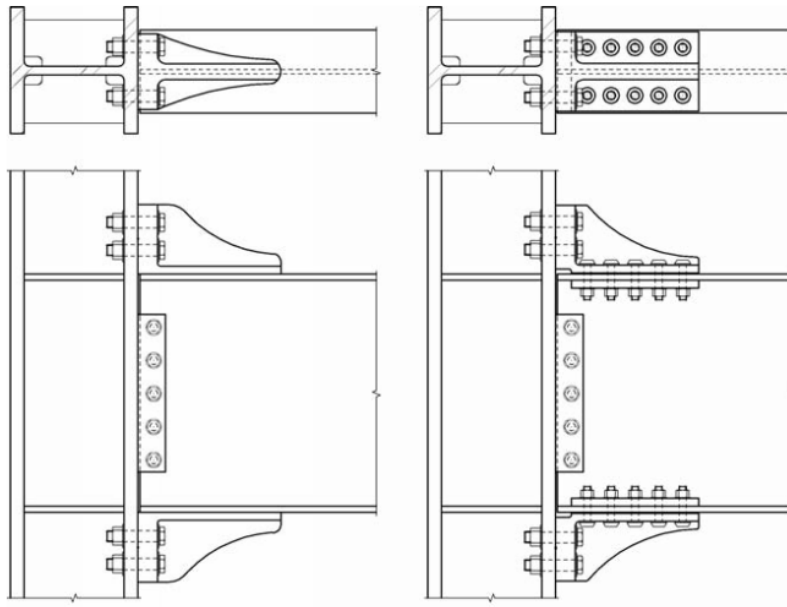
Kaiser Bolted Bracket Moment Connection
